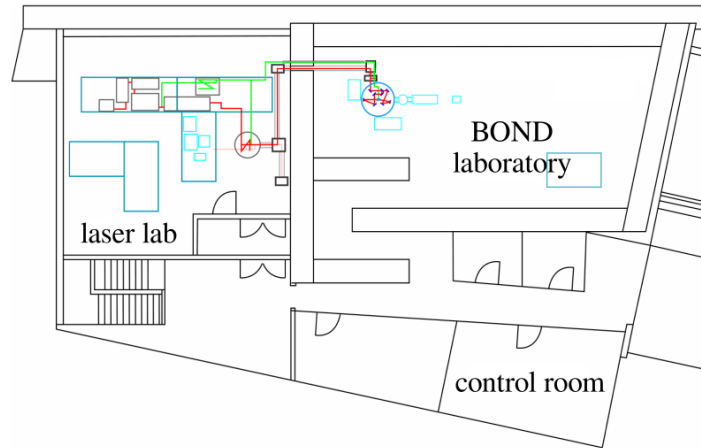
Floorplan of the FLARE facility. Adapted from [53]
